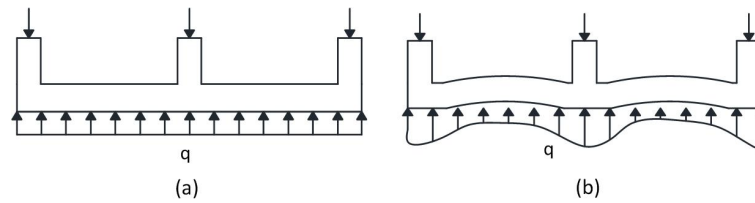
Soil pressure distribution under (a) rigid and (b) flexible footings
